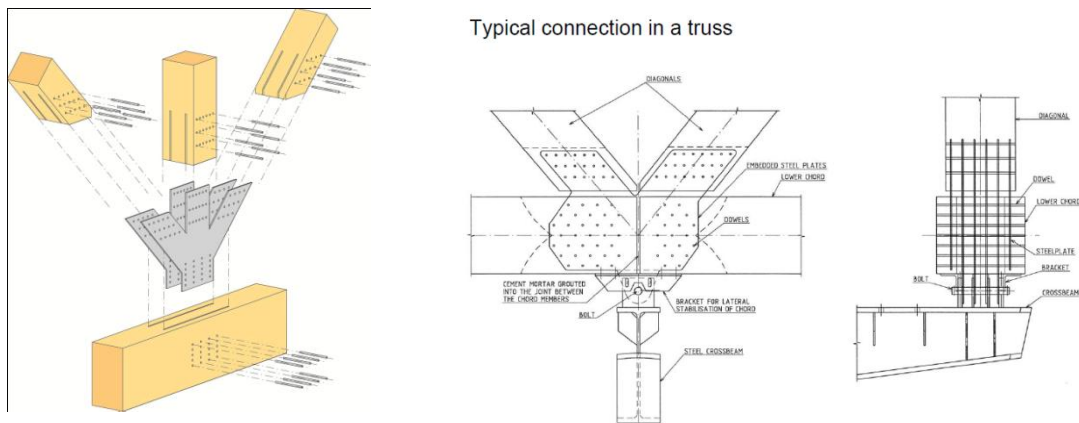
Connection with slotted-in plates and dowels. Left: Exploded view of a typical connection. Centre: Elevation of a truss node (timber lower chord, timber diagonals and steel hanger). Right: Cross section of another truss node (timber lower chord, timber diagonal and cross beam of steel).
